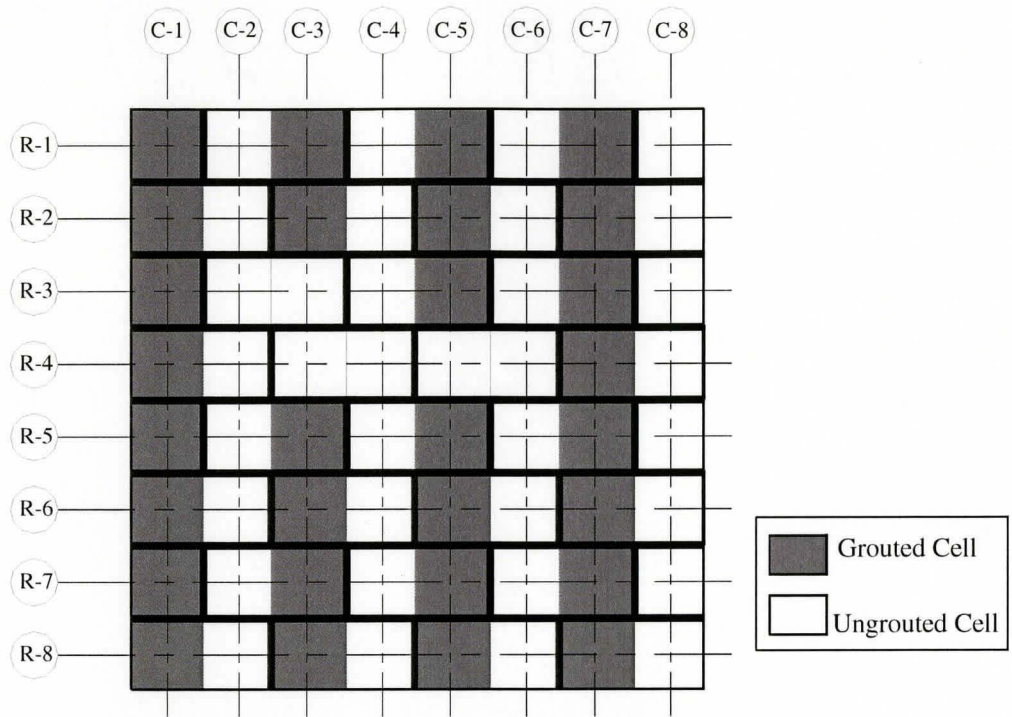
The half scale wall containing grouted and ungrouted cells
